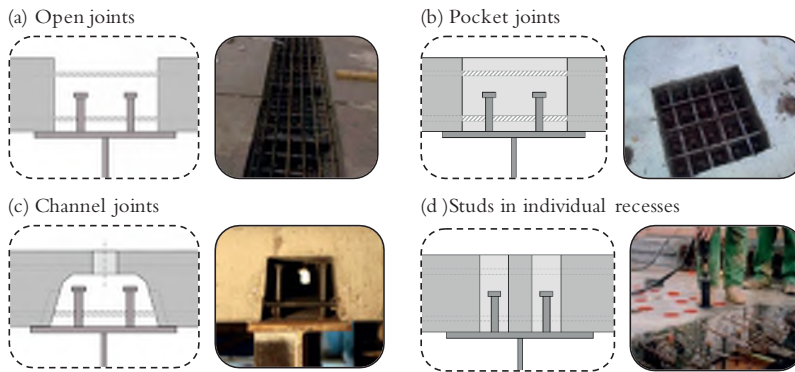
Different types of longitudinal joints in prefabricated concrete deck elements
